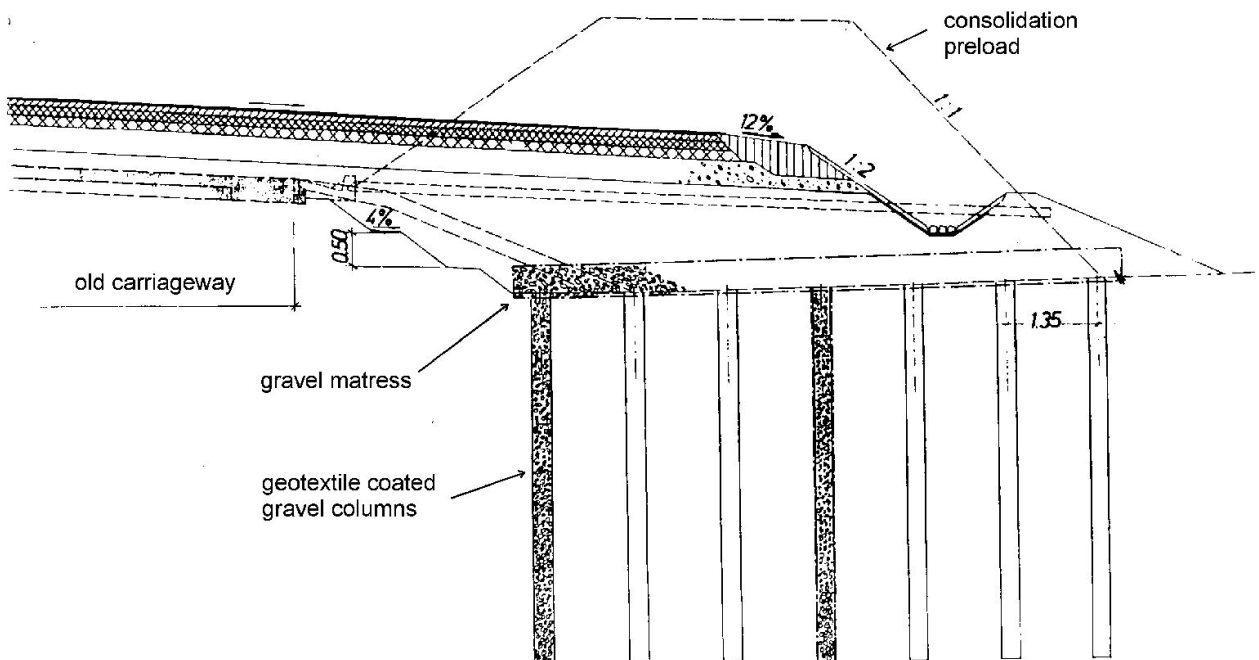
Cross section of consolidation preloading with geotextile coated gravel columns
